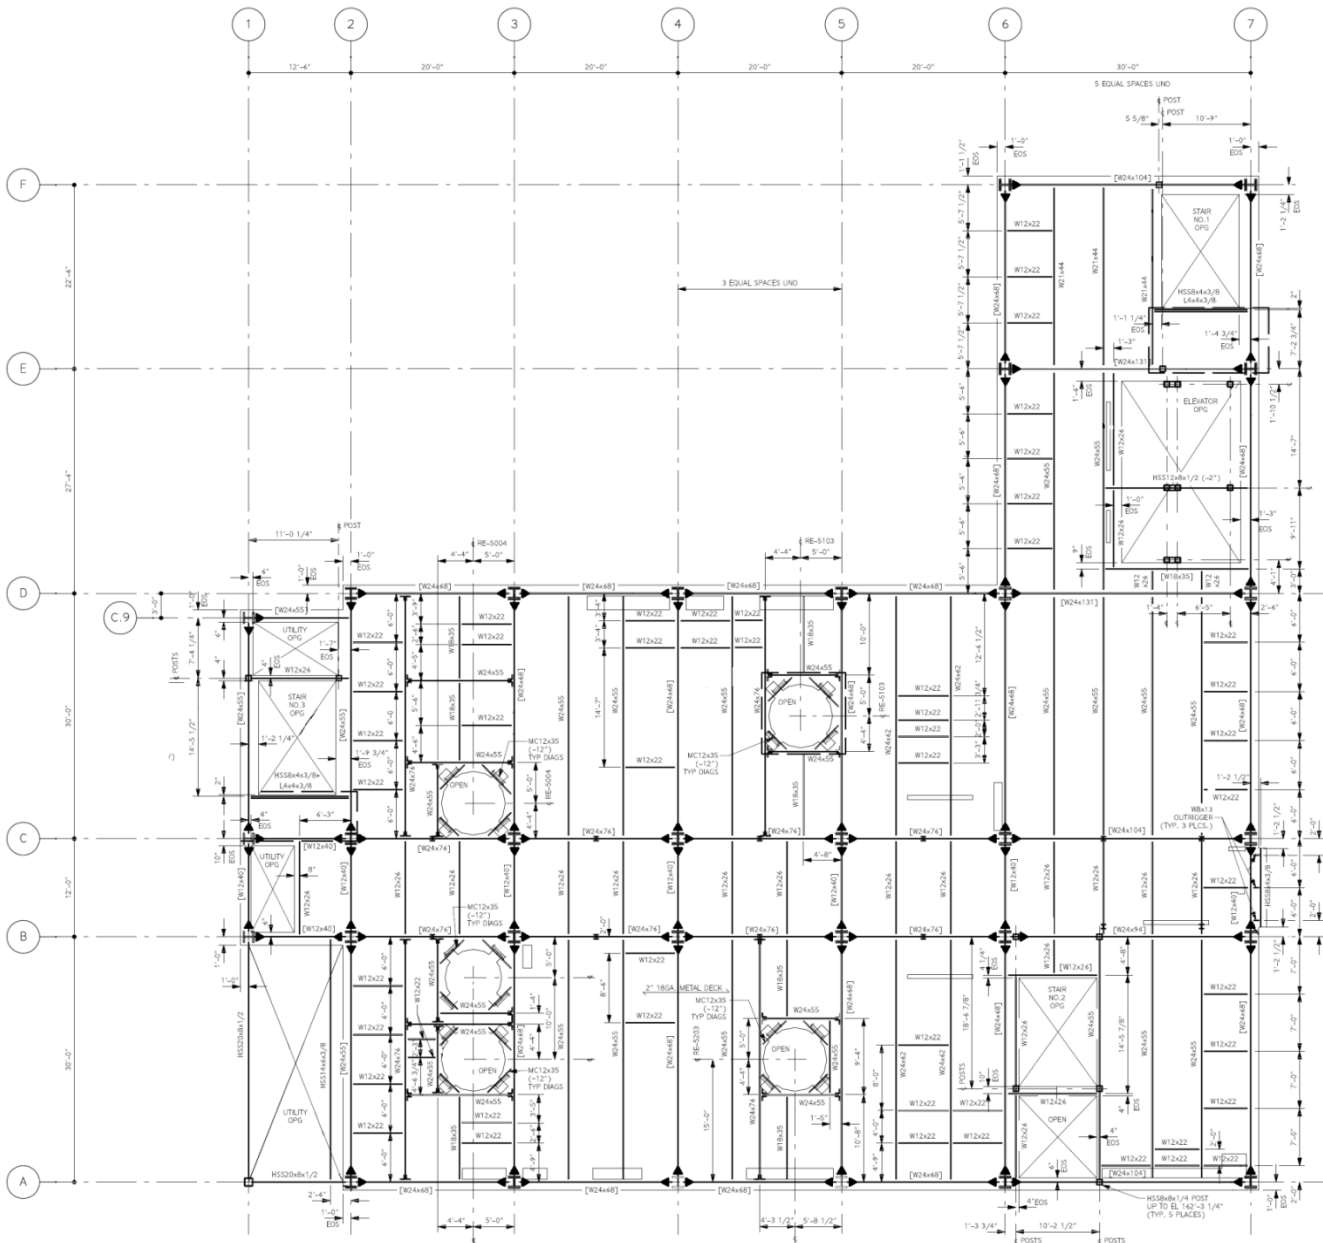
Courtesy of Project Engineer. The third floor framing plan.
